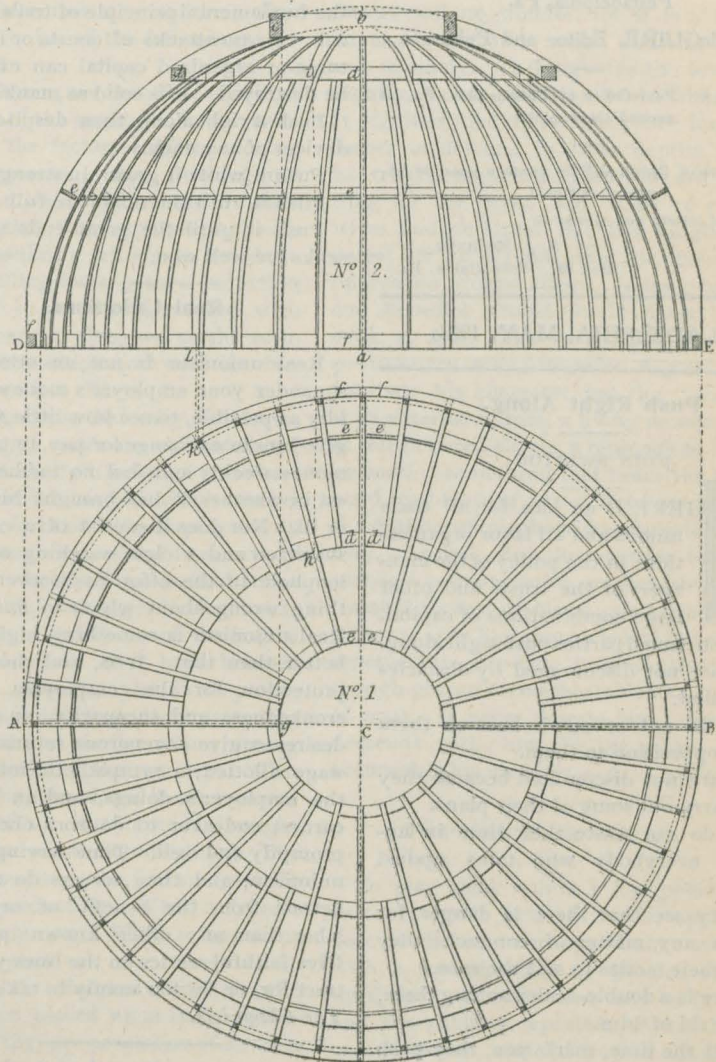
PLAN AND ELEVATION OF A DOME, SHOWING FRAMED TIMBER WORK.
